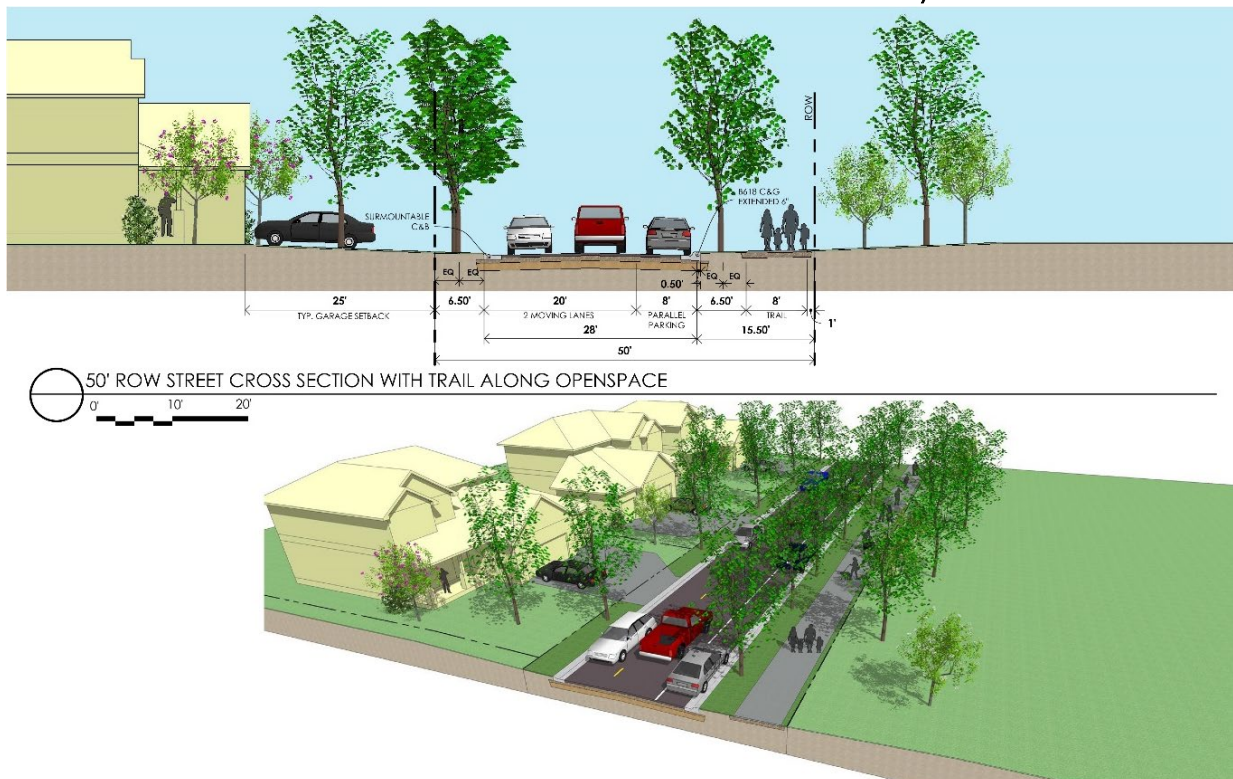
50FT RIGHT-OF-WAY: LOCAL STREET WITH SIDEWALK
